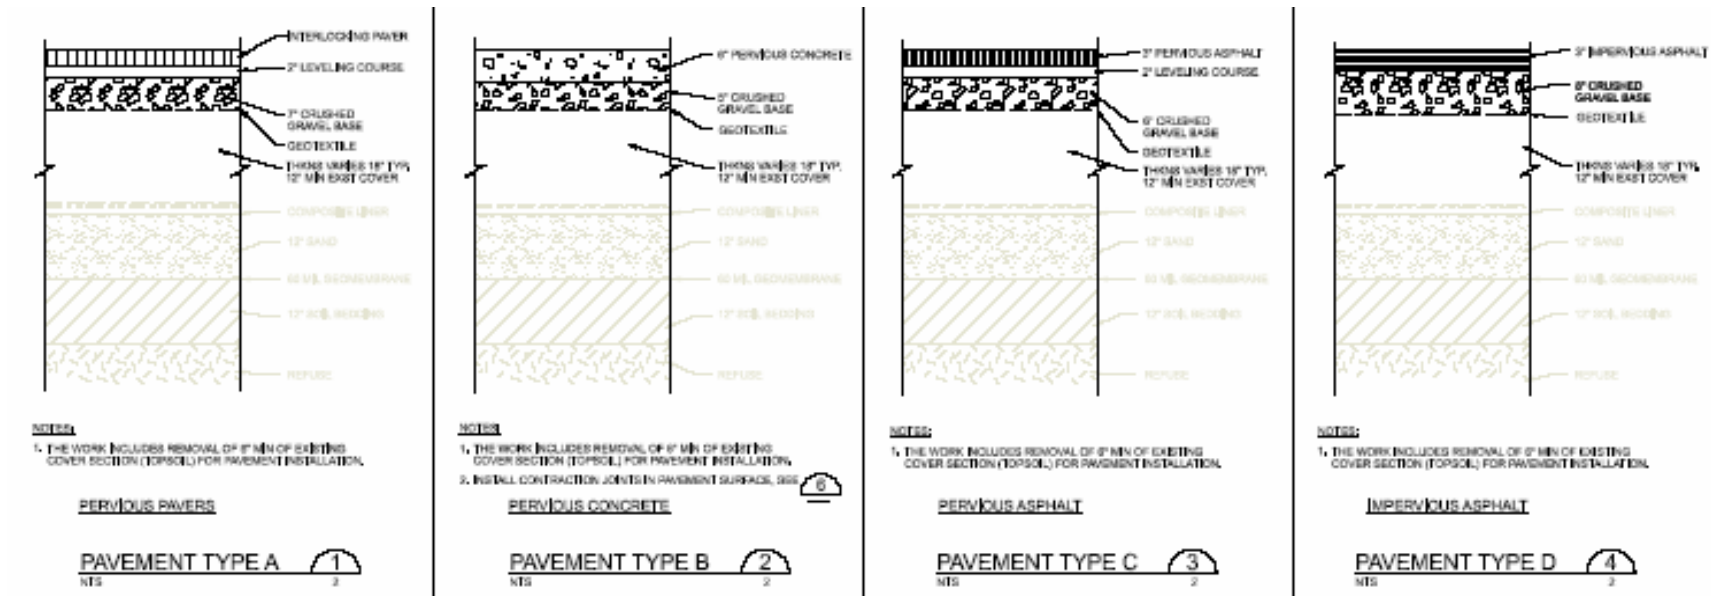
Typical Cross Section for Standard Asphalt and Pervious Pavements
